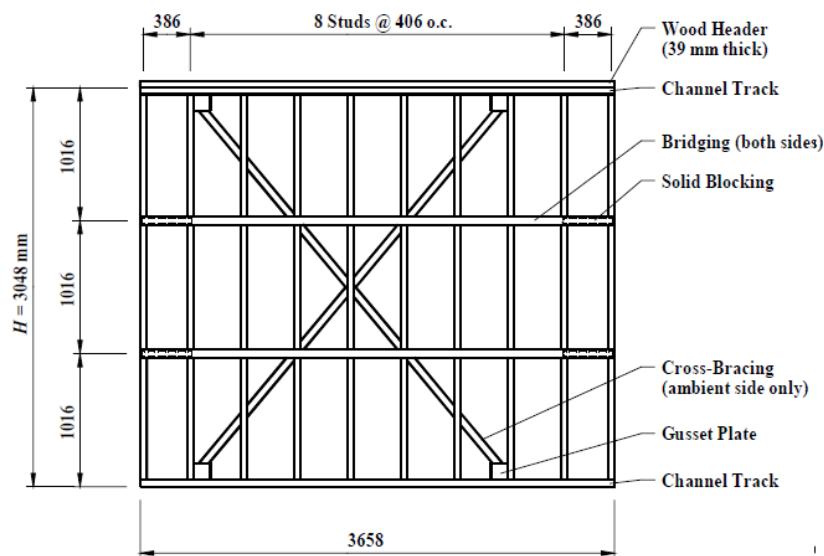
Typical steel frame fabrication layout for wall specimens [77]
